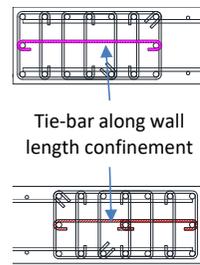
Closed hoop rebar with tie-bar along wall length confinement
